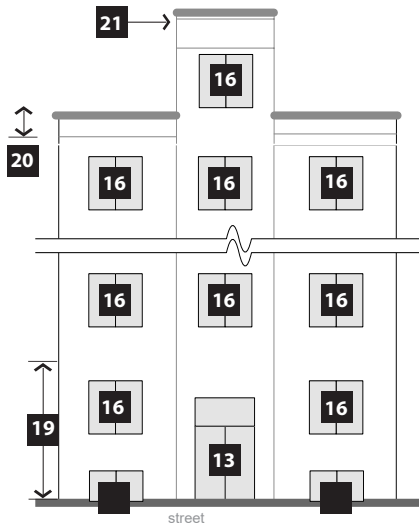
Civic building street facade diagram shown with parapet roof type. Not to scale.
